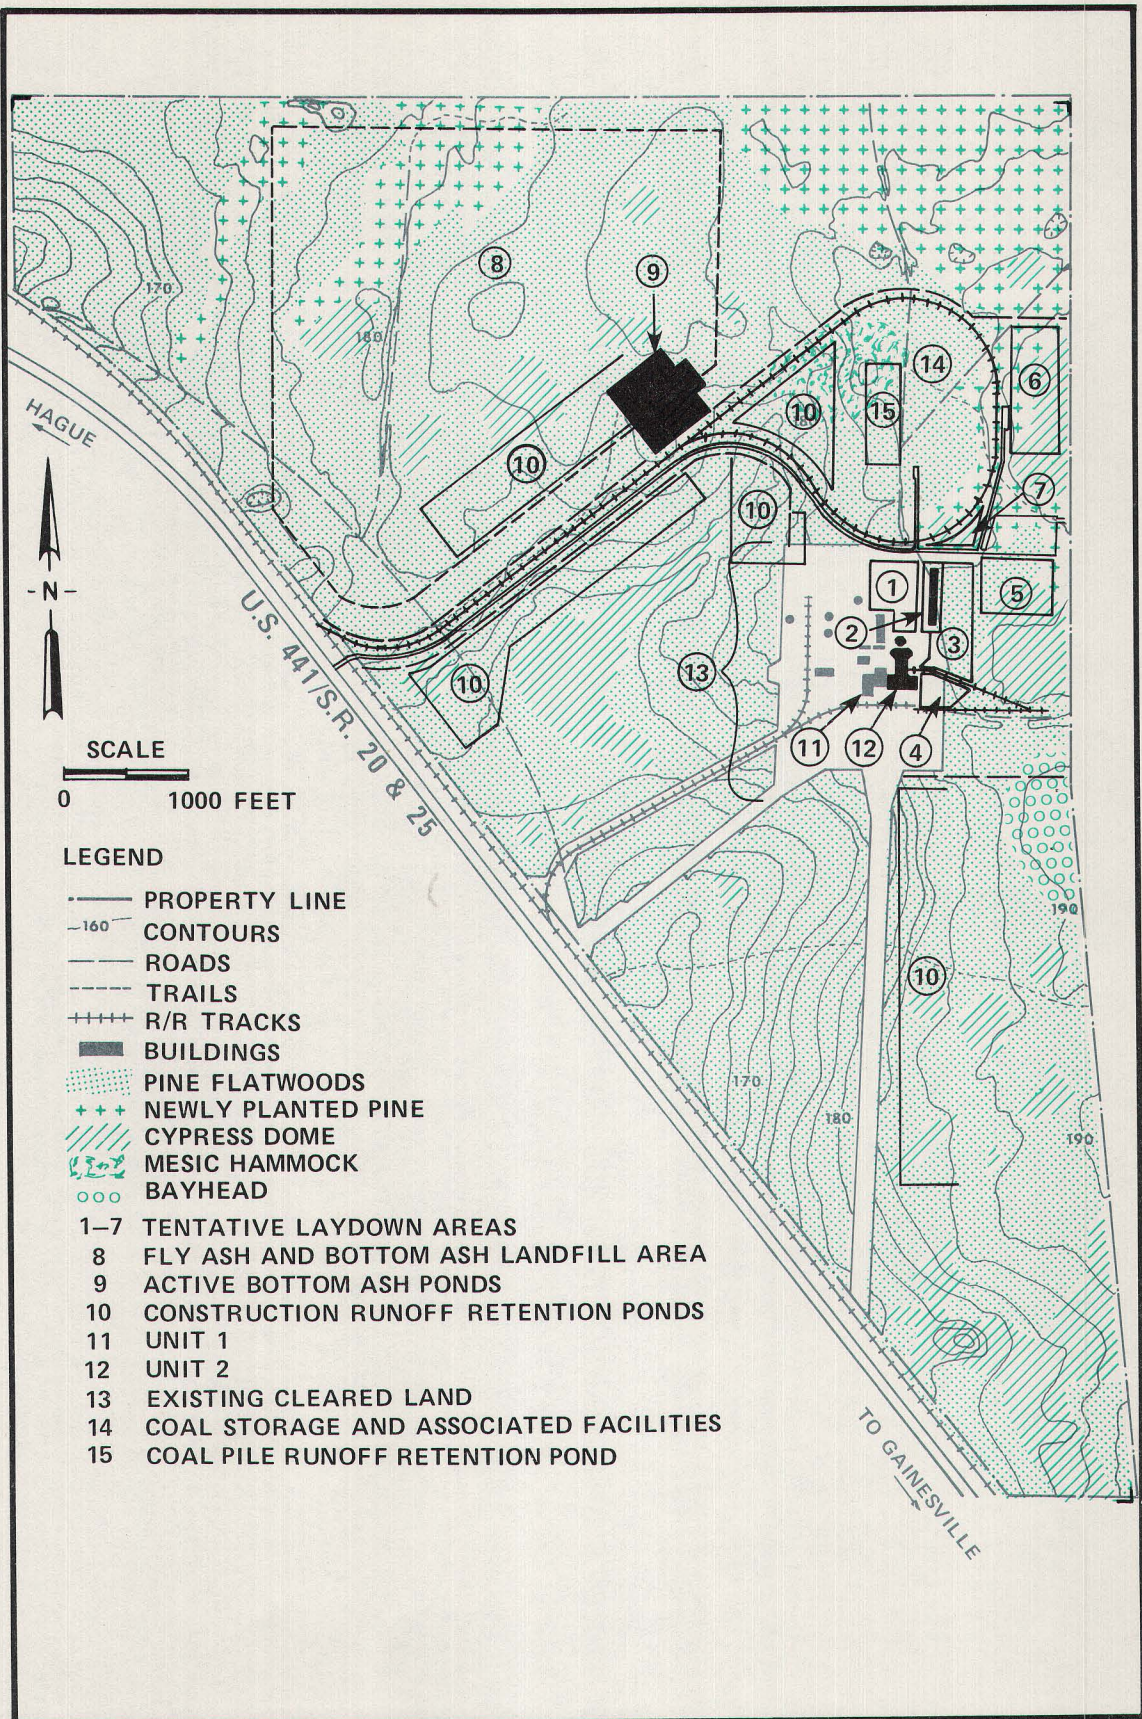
VEGETATION MAP AND PROPOSED SITE PLAN OF THE DEERHAVE SITE.
